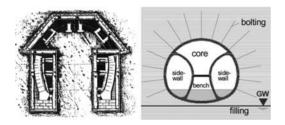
Construction procedure for Old and New Mainz Tunnels (Quick et al 2008).
